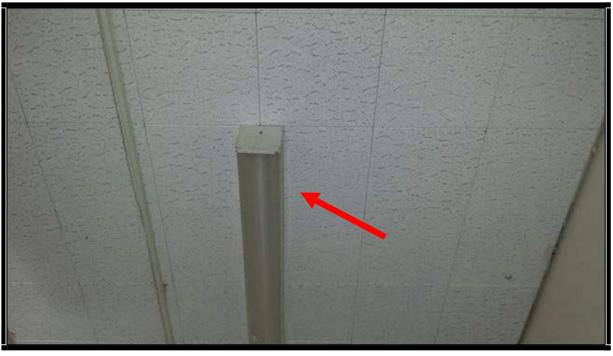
1'x1' Gouged Ceiling Tile, White
